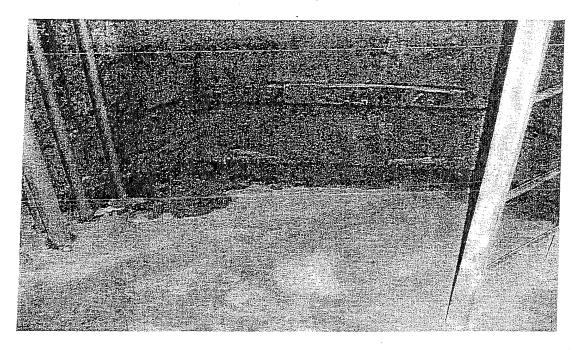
9TS4, North Wall. Melting frost and condensation are shown by the north wall of Room 9TS4, on January 18, 2007.
